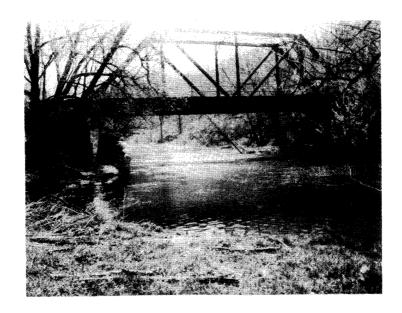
Ischua Creek looking downstream at Baxter's Mill Road Bridge.
